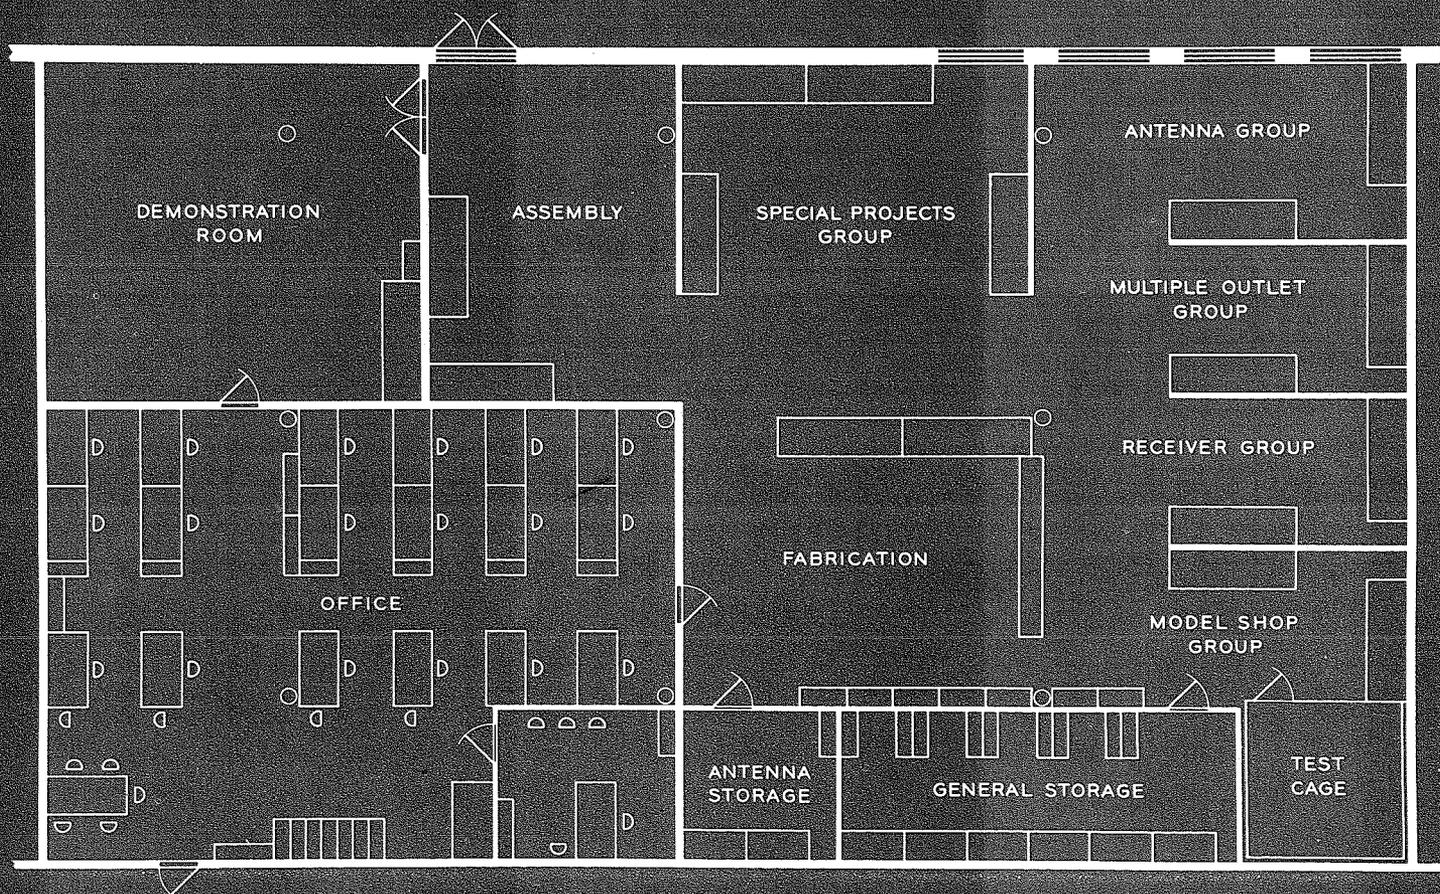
RCA Service Company Engineering facilities, located on the first floor of the Engineering Building.
